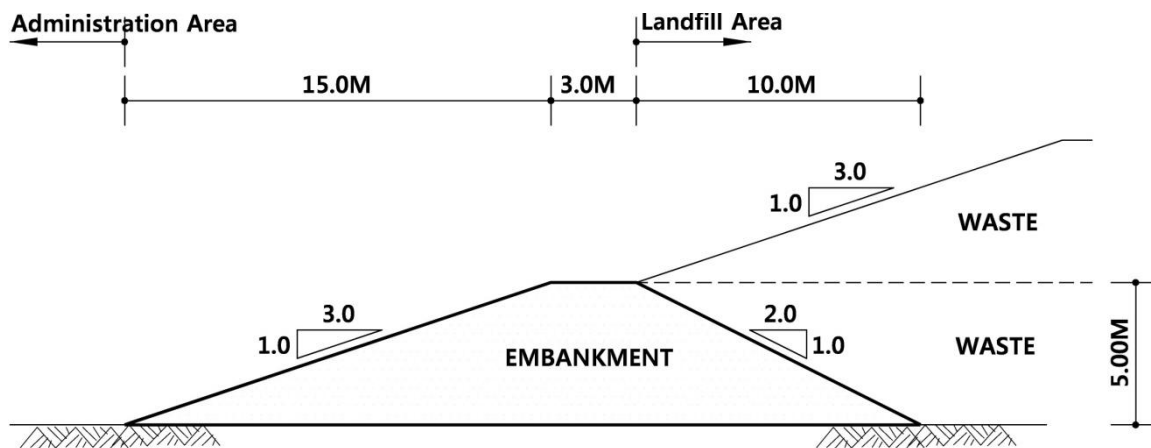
Earthen Embankment (Solid Waste Storage Structure)
